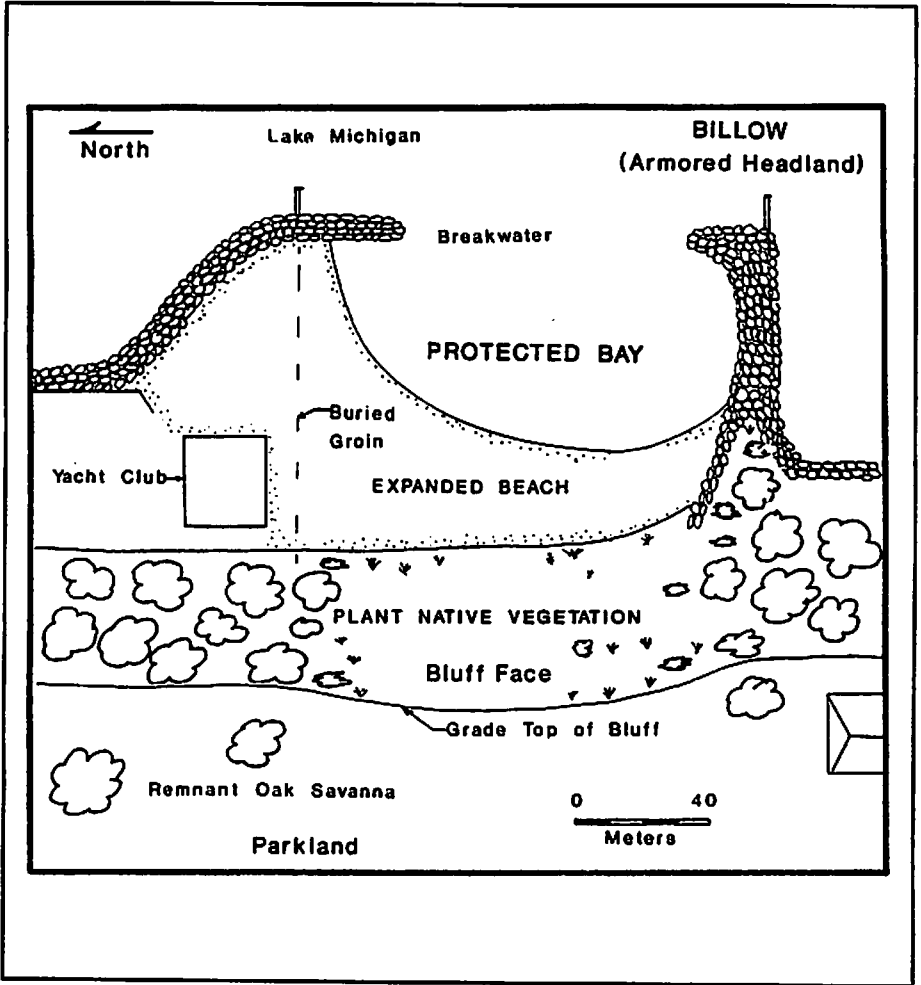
Plan view: Sunrise Park and beach restoration, Lake Bluff, Ill.
